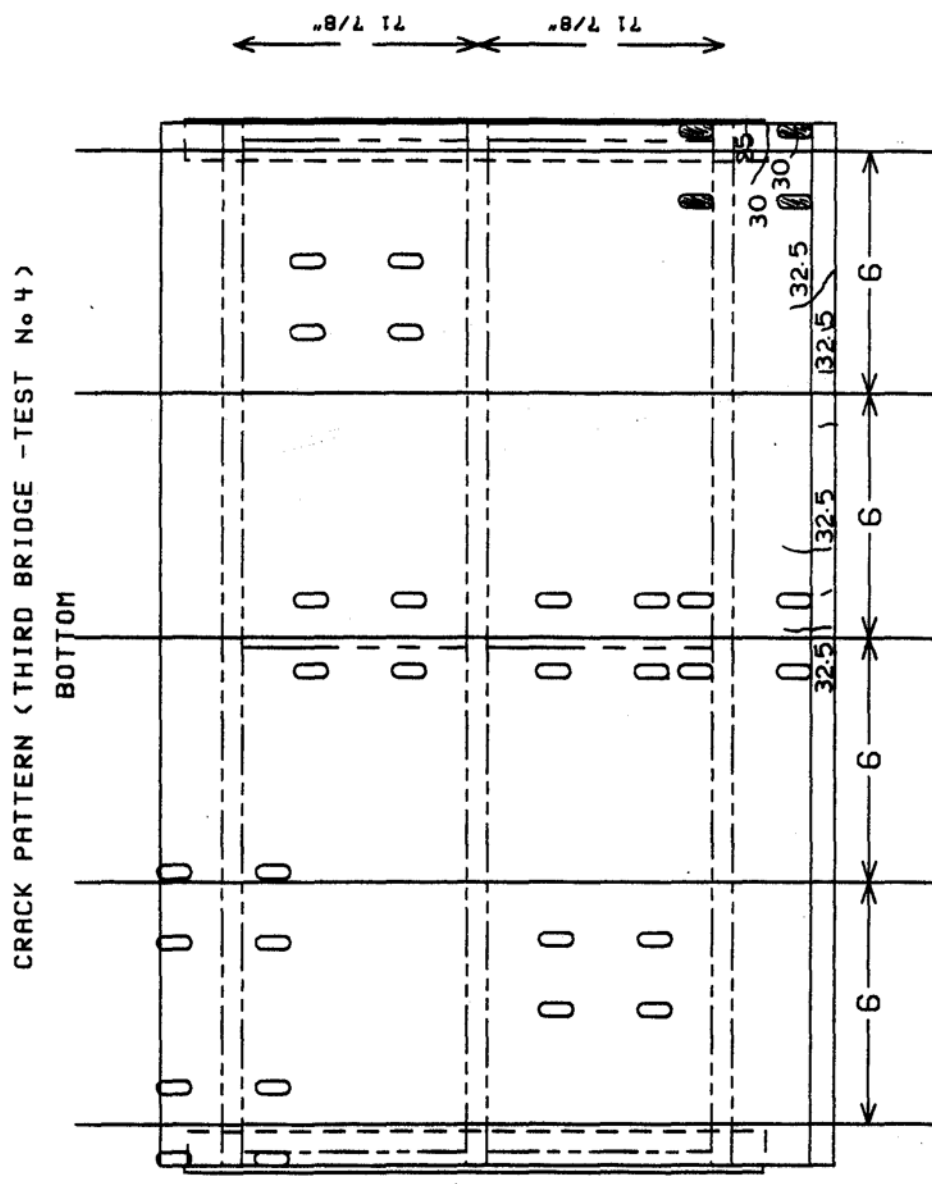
Bottom Cracking Pattern (Third Bridge - Test No. 4)
